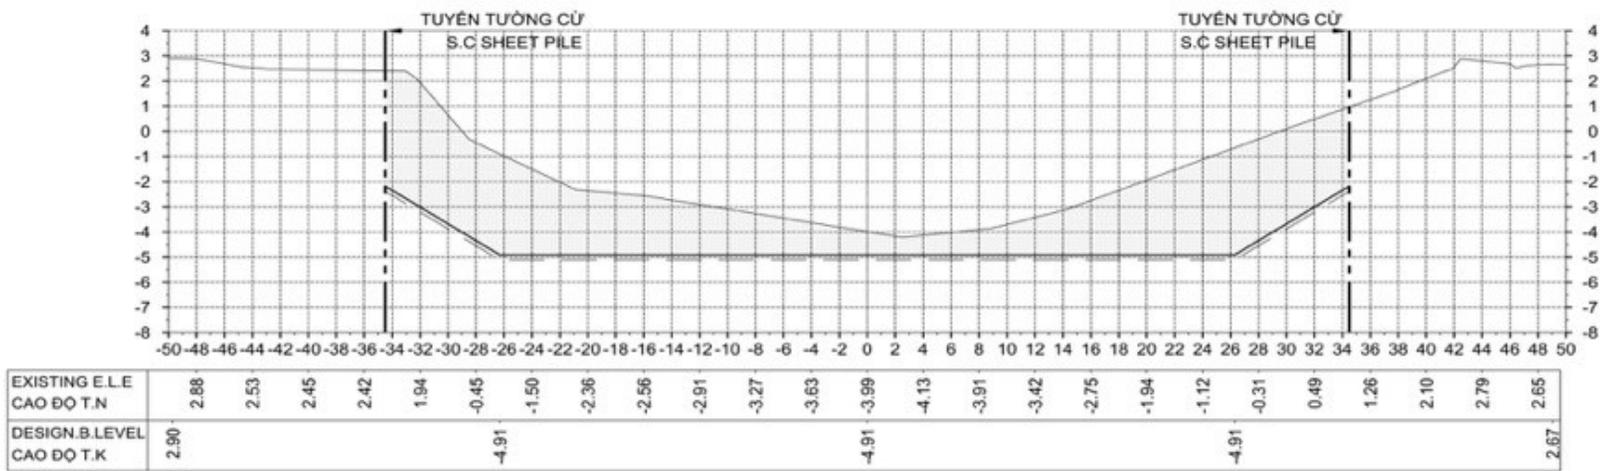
Typical dredging cross section of Cho Lach canal (with embankment)
